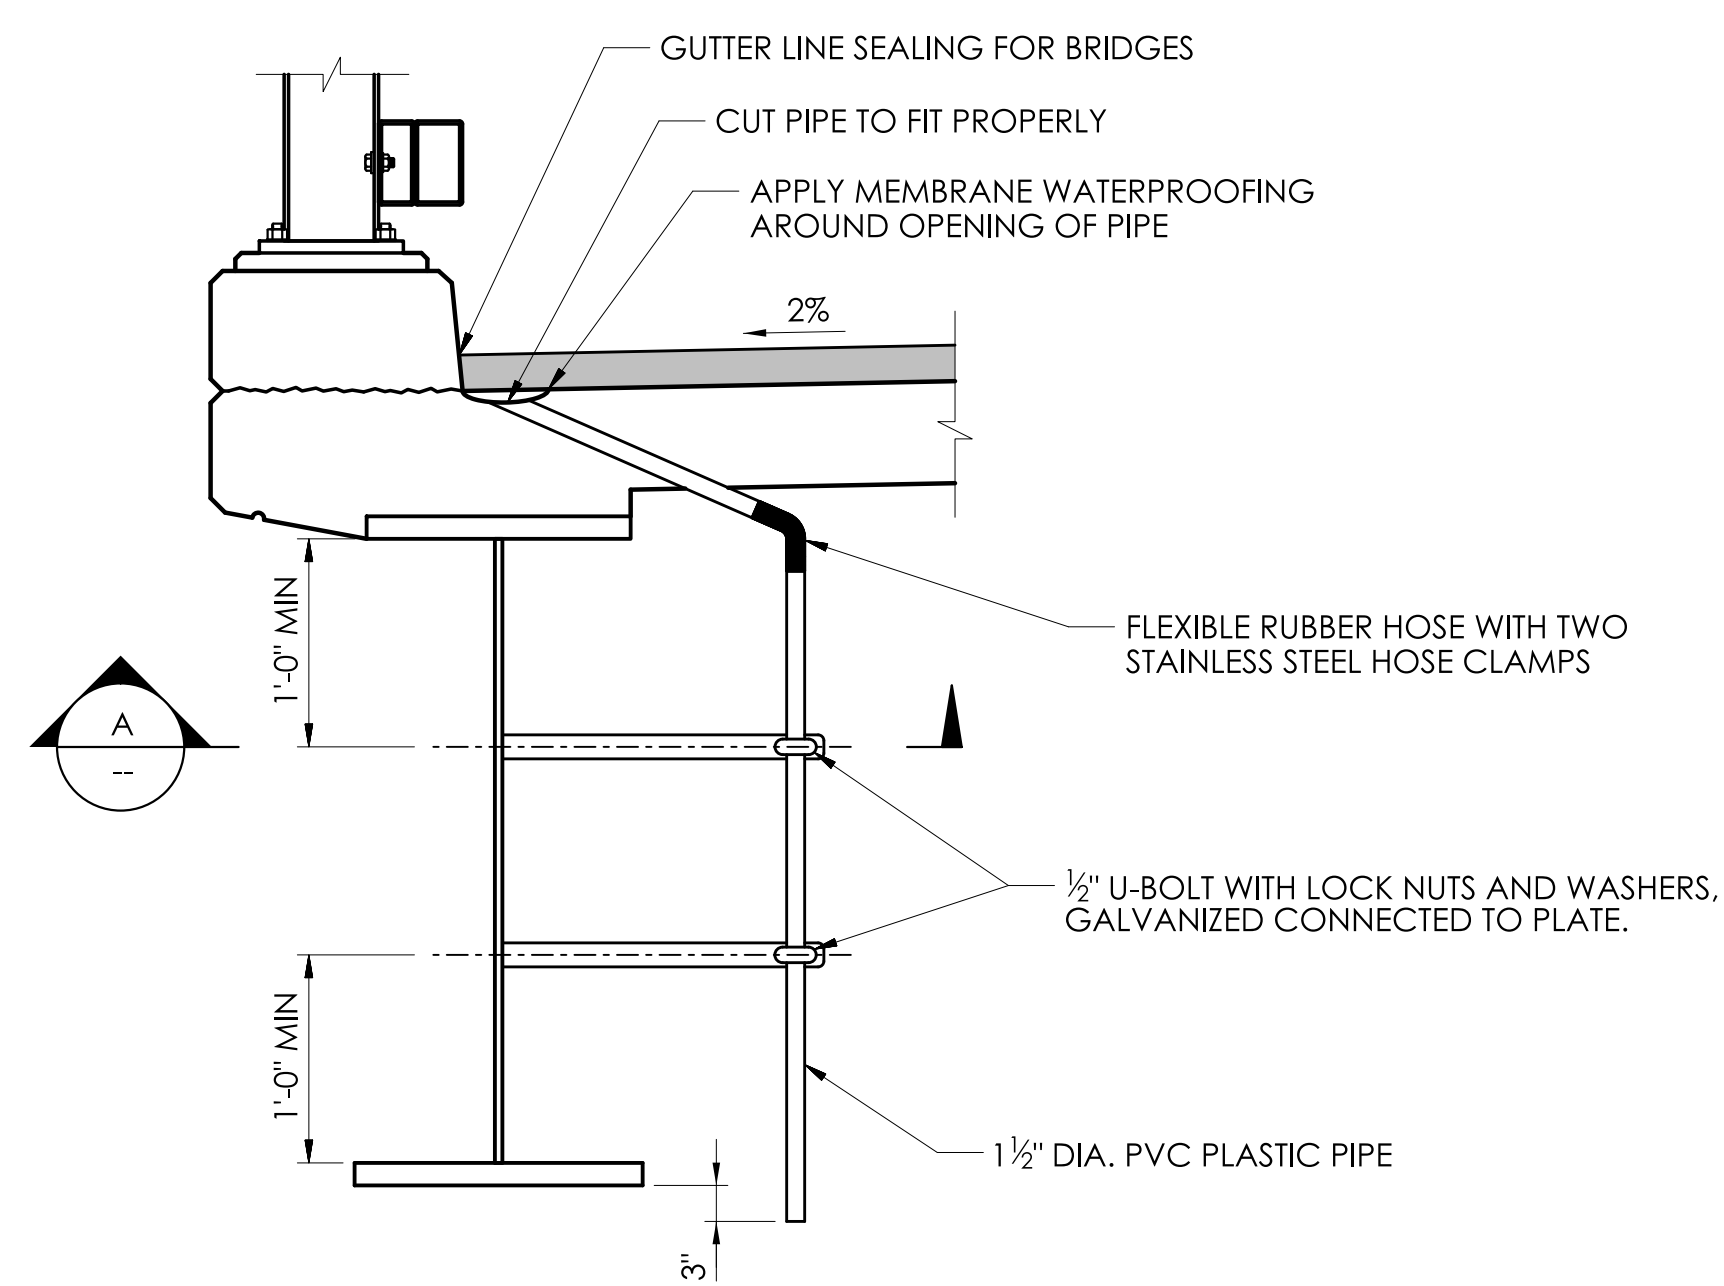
DETAIL A - MEMBRANE DETAIL AT SIDEWALK
